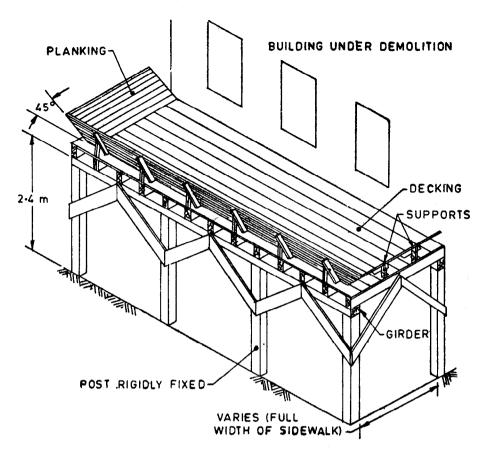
TYPICAL SKETCH OF A SIDEWALK SHED
